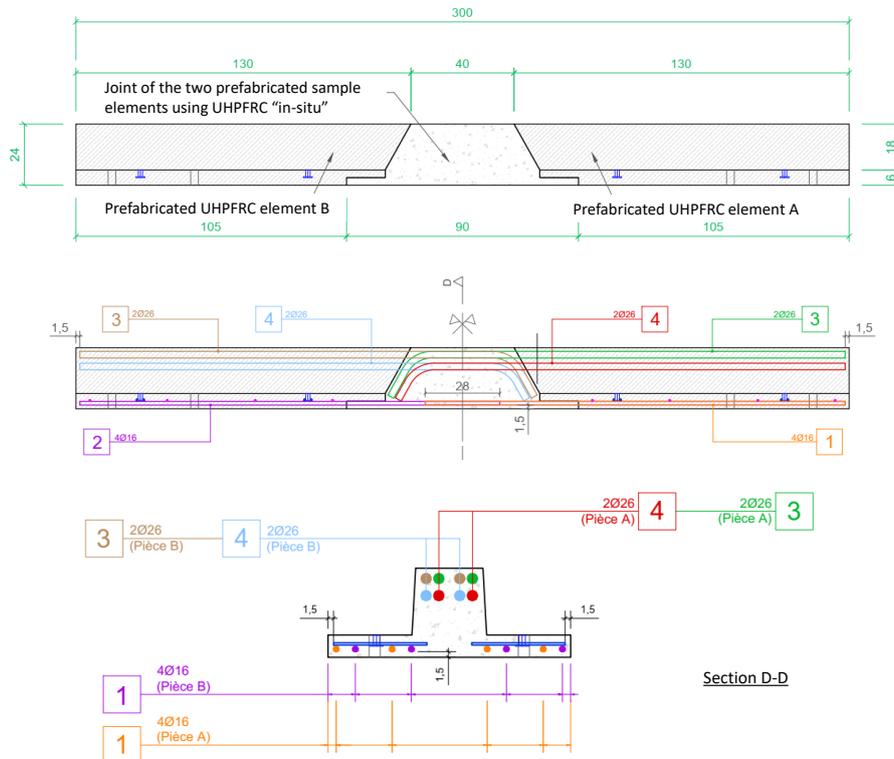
Elevation of the prefabricated sample and section with reinforcement rebars at the joint of the crossbeams.
